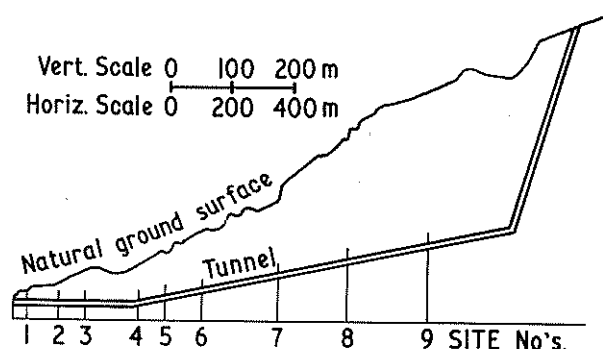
Observations in Kangaroo Tunnel - arrangement of installation.
